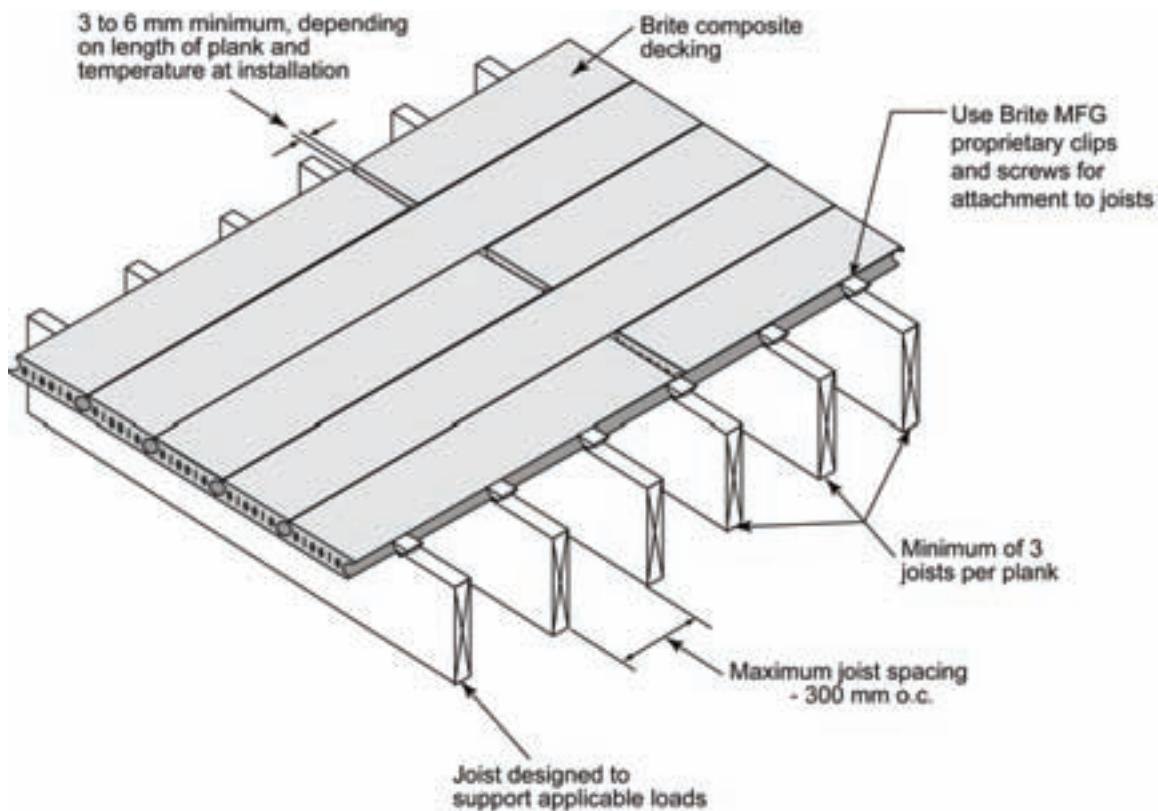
Installation of "Brite Composite Decking (Hollowcore)" Decking
